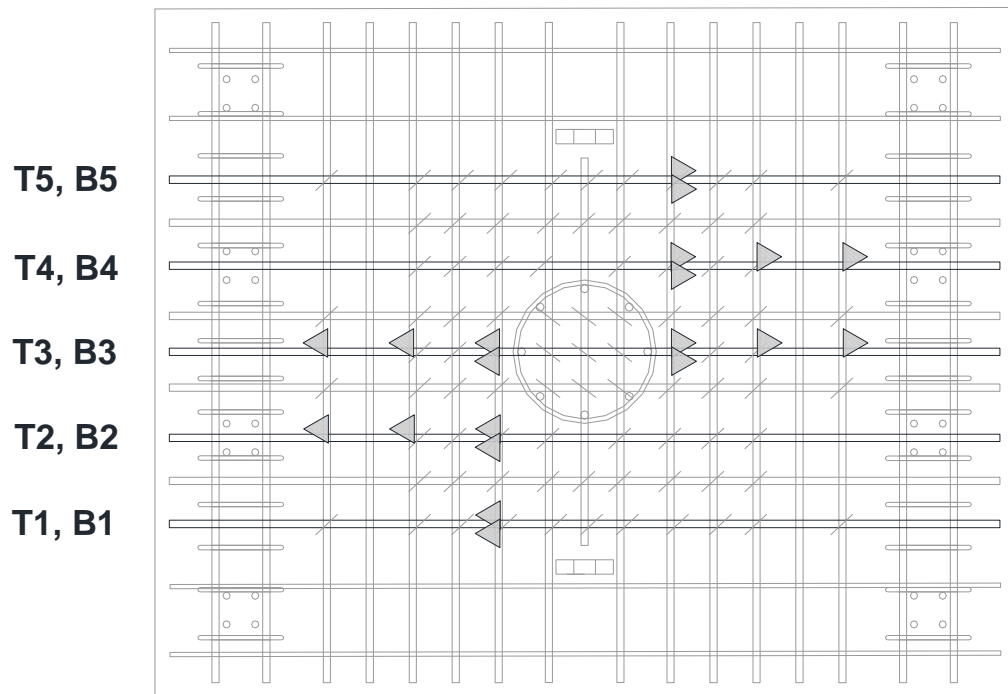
Strain gages on J-bars and vertical stirrups in the slab of Specimen #2
